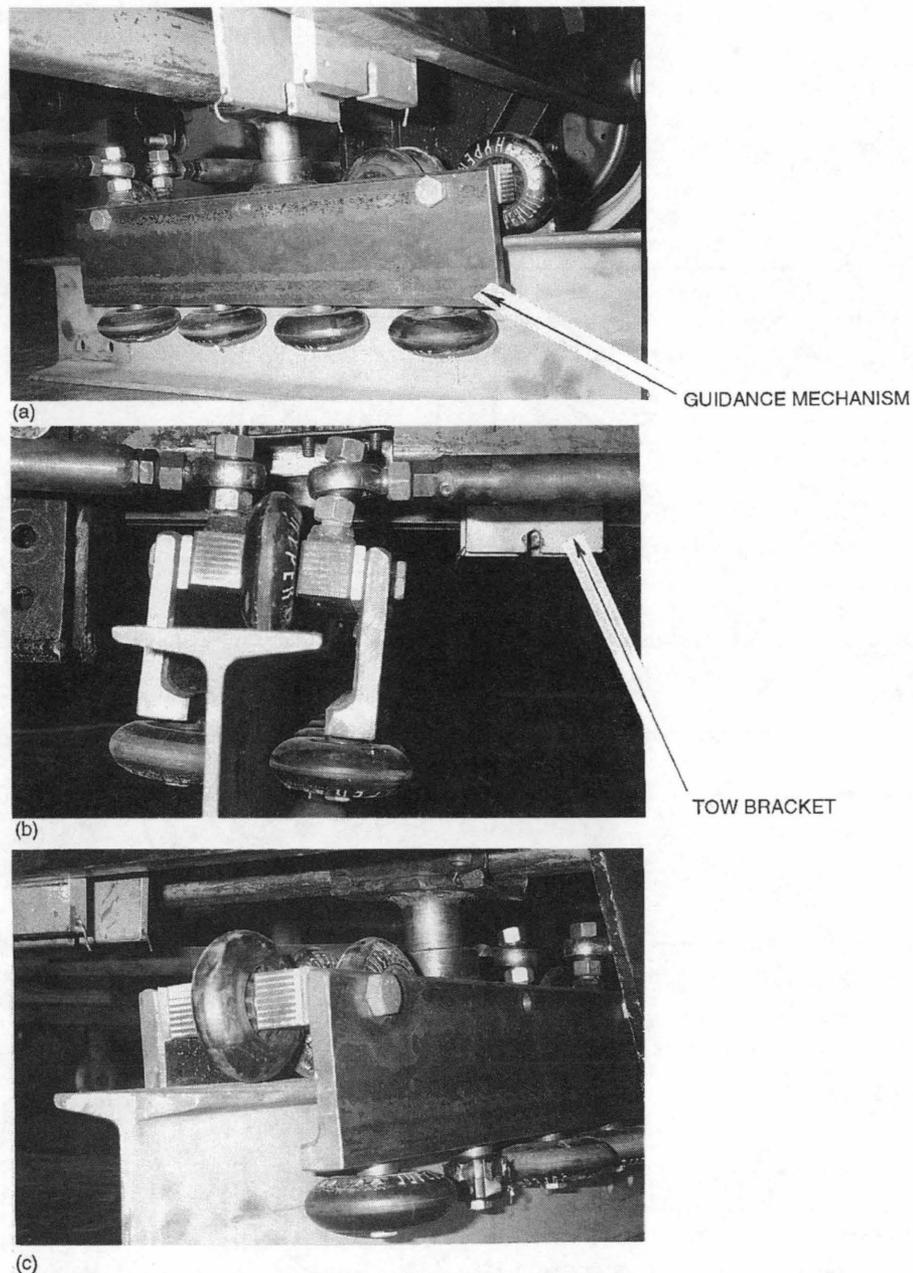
Guidance mechanism and tow bracket: (a) right side view from front, (b) rear view, and (c) left side from front (lateral guide wheel is damaged).
